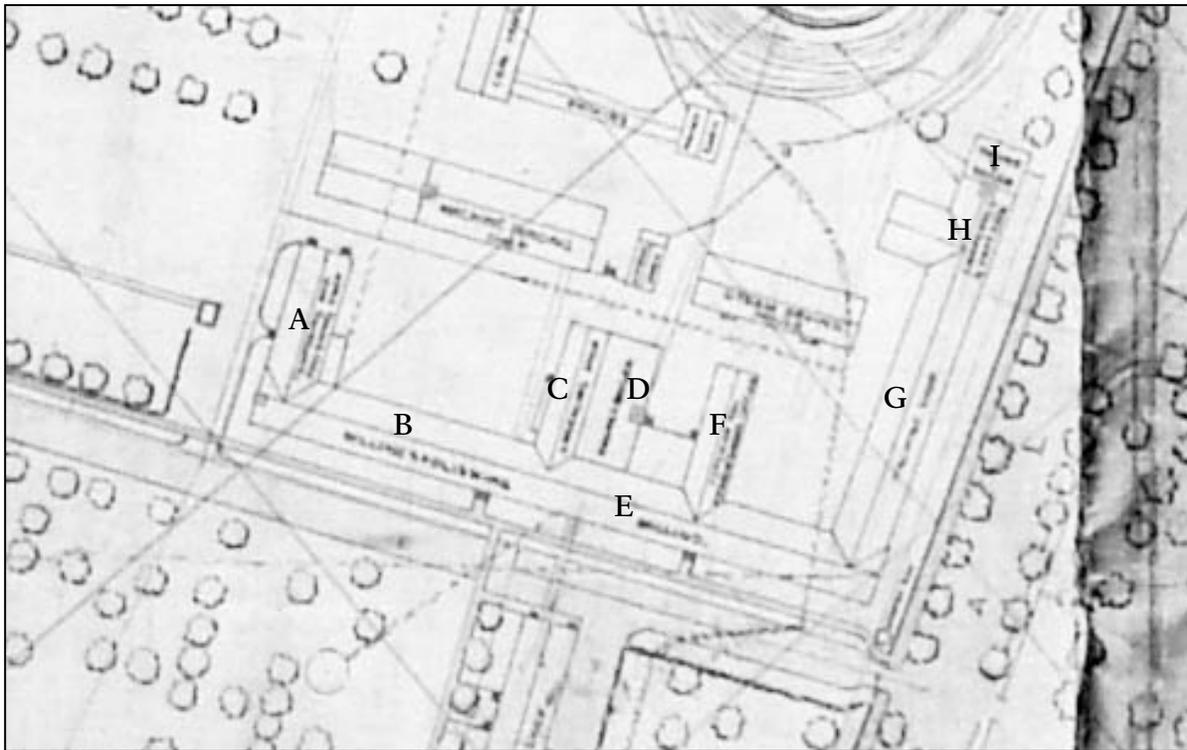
Detail from “Topographical Plan of the Springfield Armory, Springfield, Massachusetts, April 1864 (fig. 11).” The sections of Building 27 are labeled as follows: A: Tempering and Polishing Shop; B: Milling and Polishing Shop; C: Annealing Shop; D: Engine and Boiler (Rooms); E: Milling; F: Foreman and Draughtsman Offices; G: Machine Shop; H: Carpenter and Pattern Shop; I: Engine and Boiler (Room).
